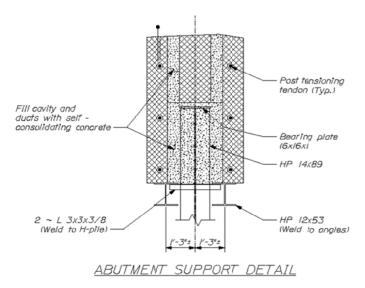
Precast Abutment Section Showing Void And PT Bar Locations (reproduced with permission from PCI).
